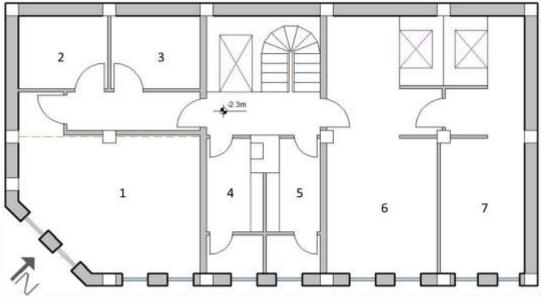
Underground Floor Plan (after conservation) (Dersaadet Hotel)
